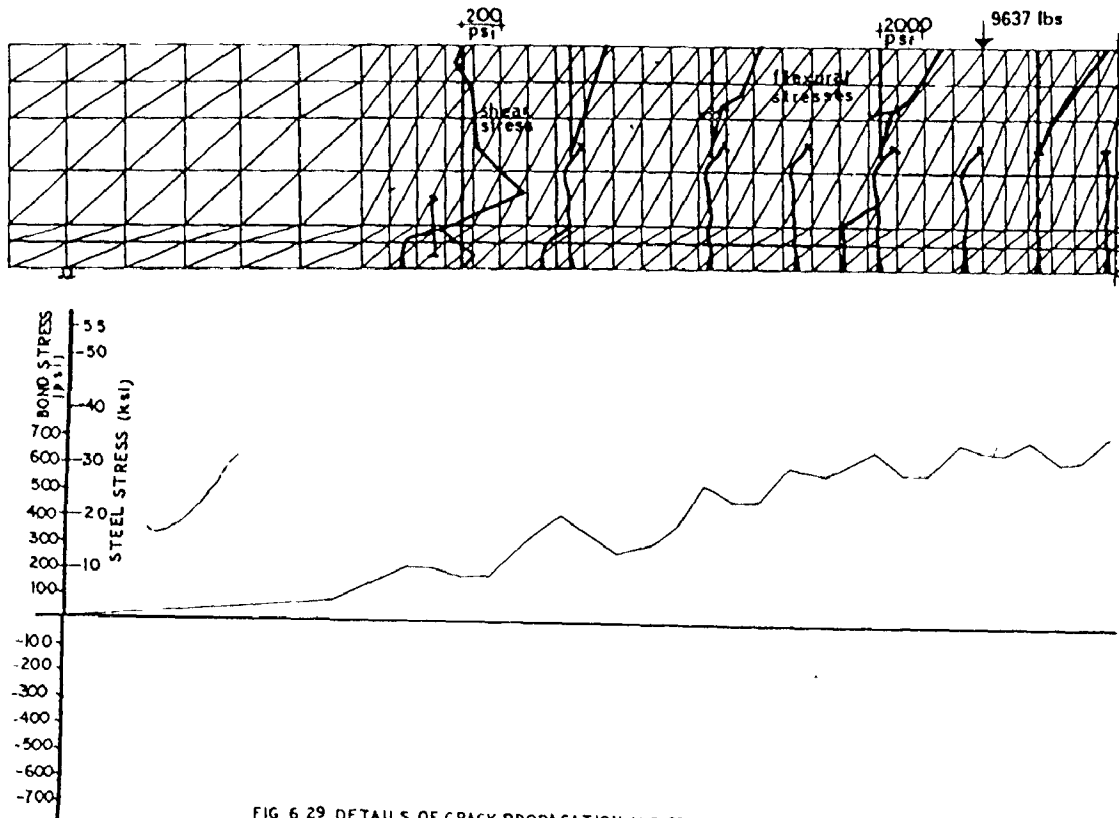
DETAILS OF CRACK PROPAGATION AND CONCRETE, STEEL AND BOND STRESS DISTRIBUTIONS FOR BEAM(7/1)
